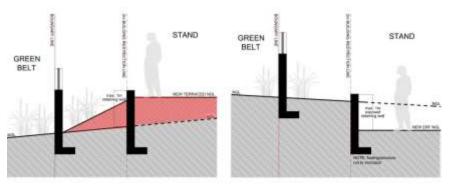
\_Diagram illustrating typical retaining wall instances on park/open space
